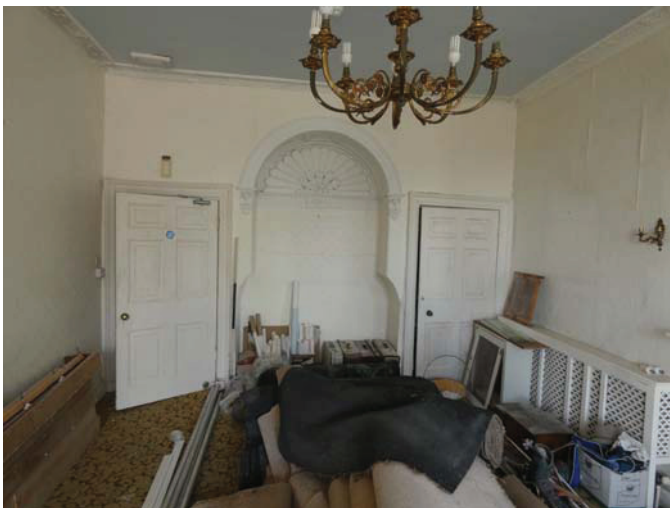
(left): The south-west elevation of Room G2, viewed from the north-east
